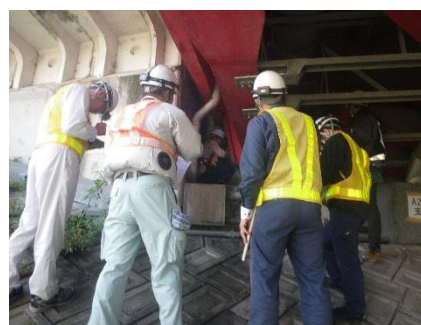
Trainees conducting a hands-on observation on a bridge in the MLIT bridge inspection course
